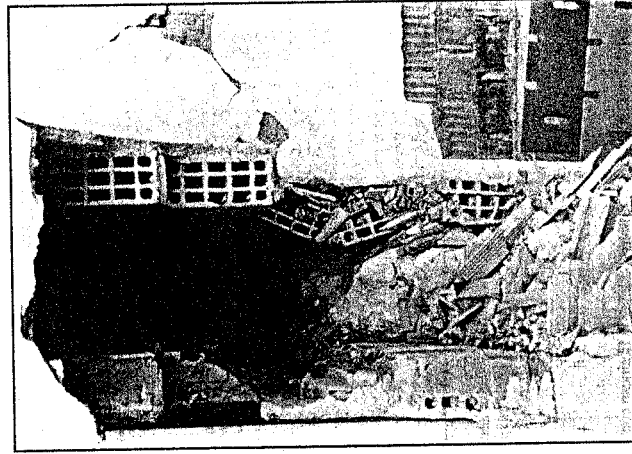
Damaged double-layer URM walls sandwiching insulation
